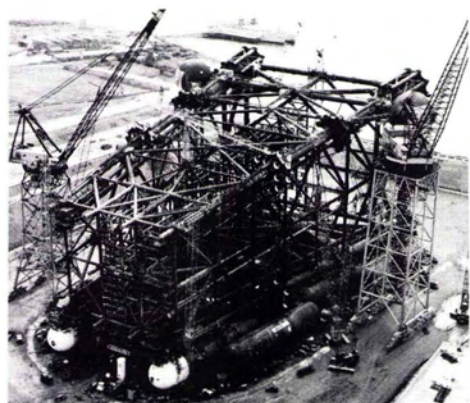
A completed steel jacket awaiting the flooding of the graving dock prior to tow-out into the sea.
